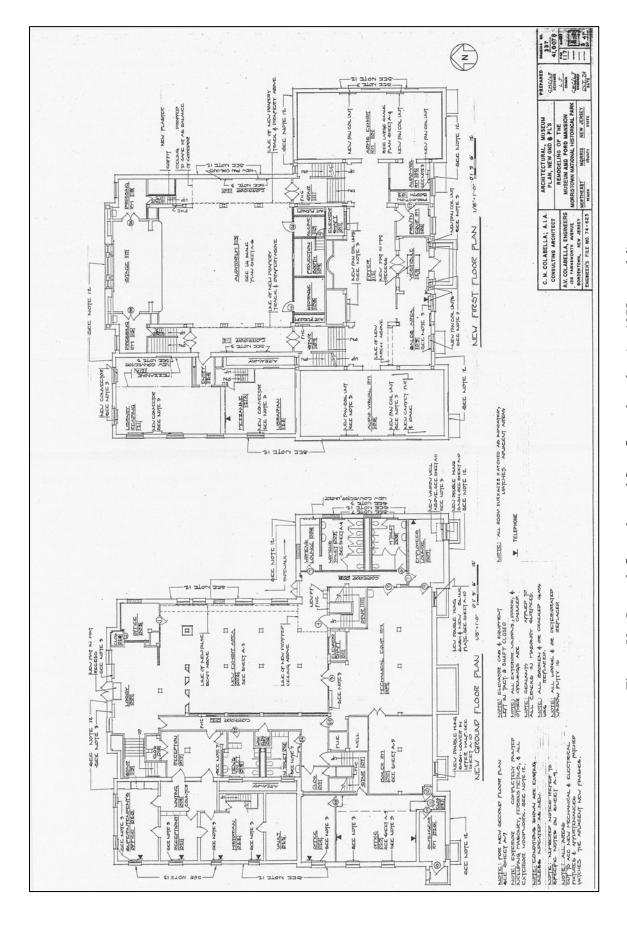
Ground- floor plan and first- floor plan, showing 1975 remodeling.
